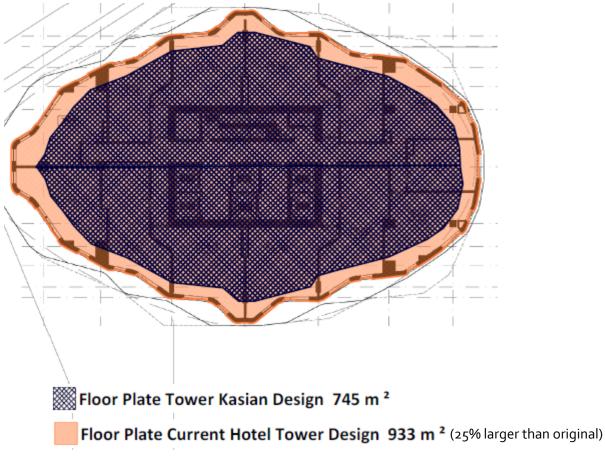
Comparison of Tower Floor Plates between Previous 2014 Development Permit & Current Proposal
